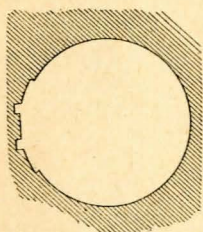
Showing how to cut away the earth to support a door frame and retaining walls for a bank silo.
